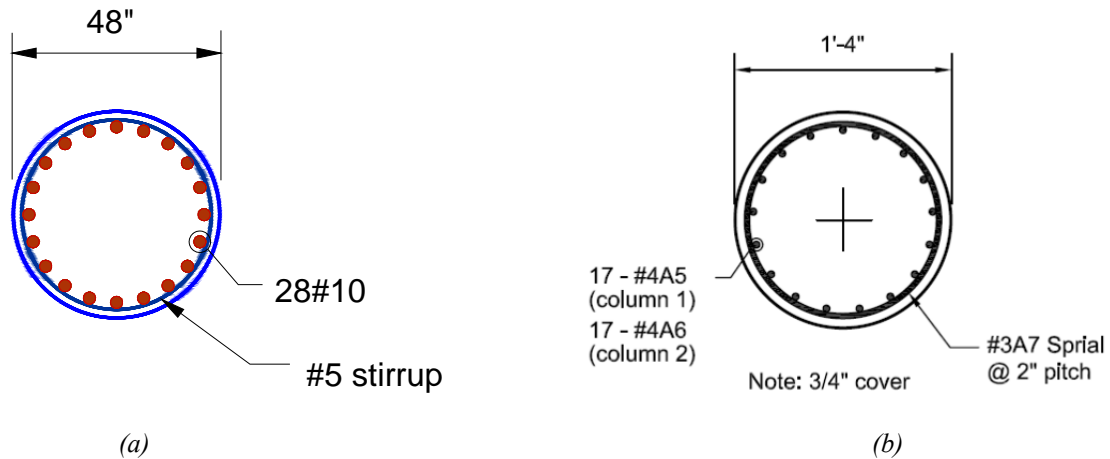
a) Cross-section of full-scale piers b) Cross-section of 1:3 scale piers
